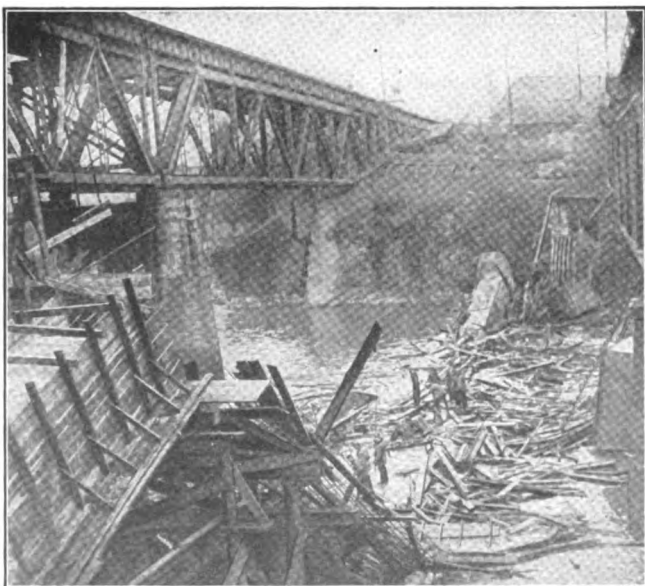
LOOKING EAST OVER BRIDGE RUINS
